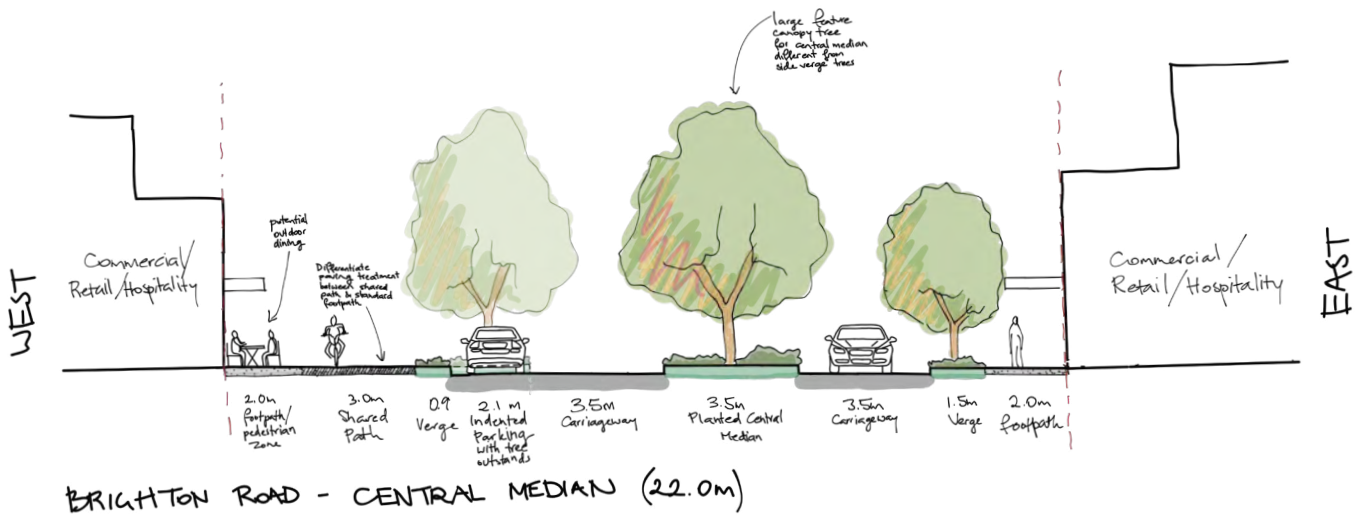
Section C - Brighton Road – Town Centre Core – Typical Section
